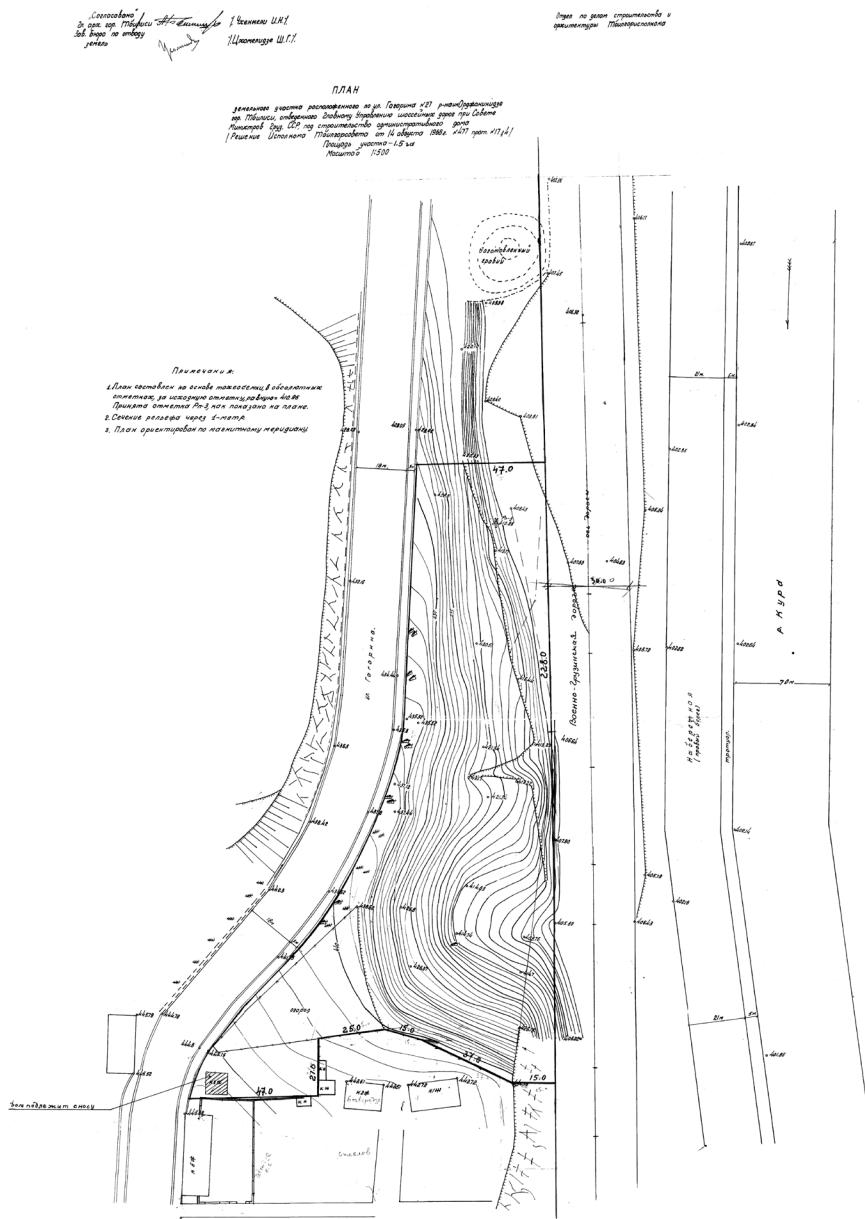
Plan of the land plot located on Gagarin Street No. 27
